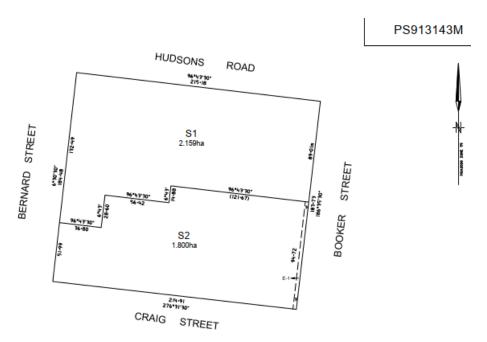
Proposed plan of subdivision, Source: Application documents (CA220161)
